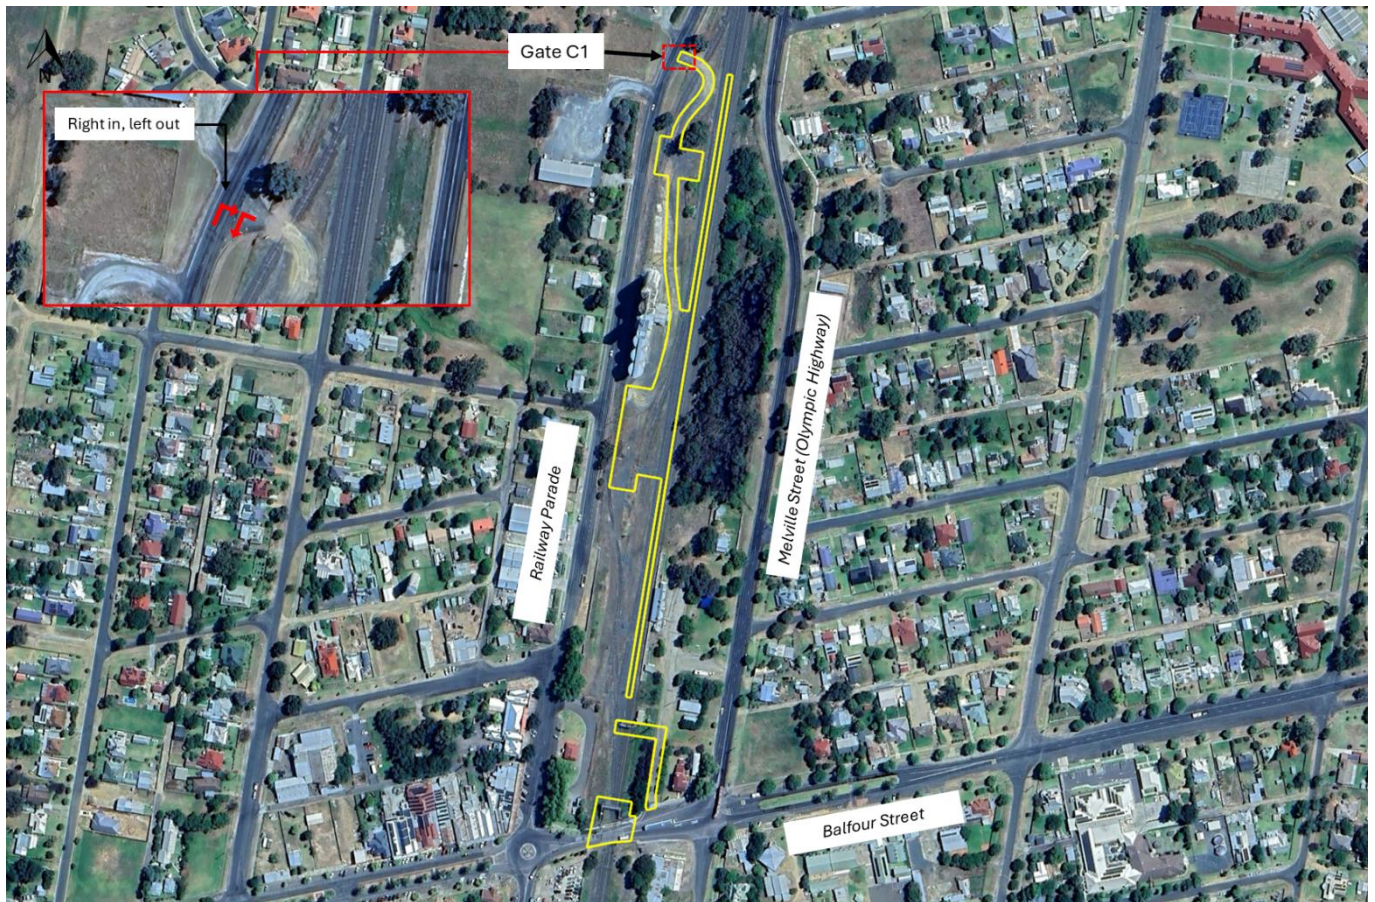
SITE ACCESS DETAILS – GATE C1
